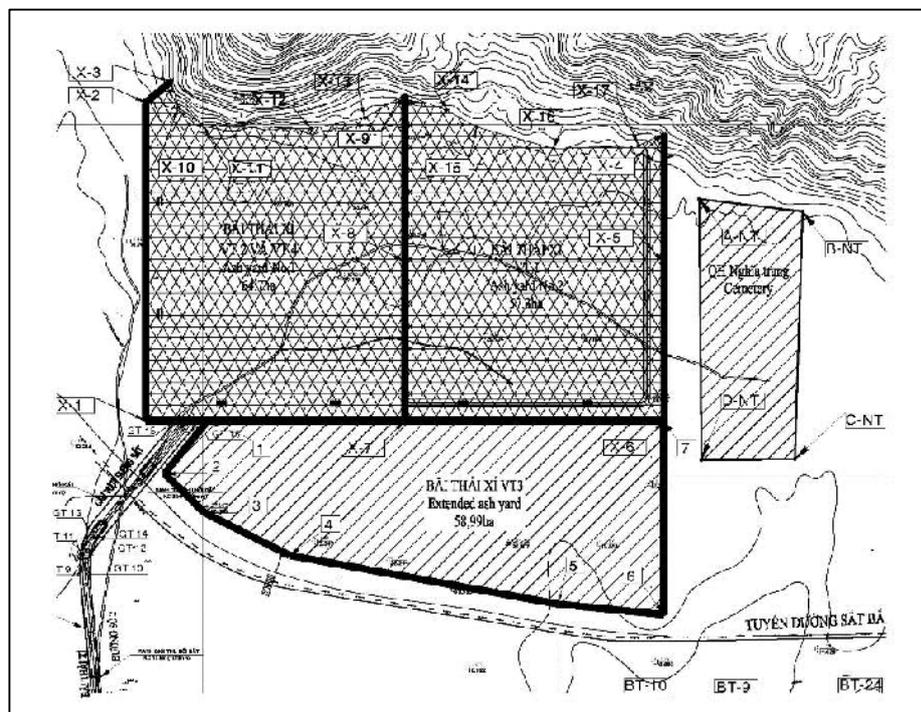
Place subdivision ash pond foot of the mountain Ho Dua - stage 1
